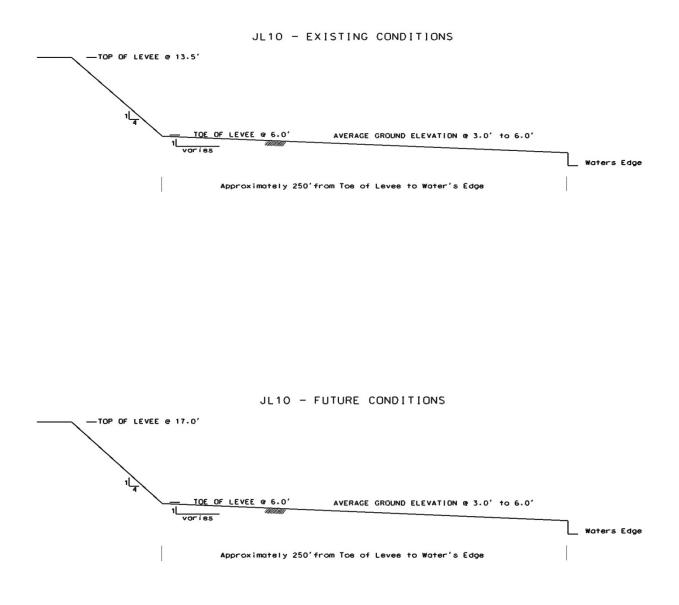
Typical Levee Design Cross-sections US Coast Guard Station Levee (JL10)
